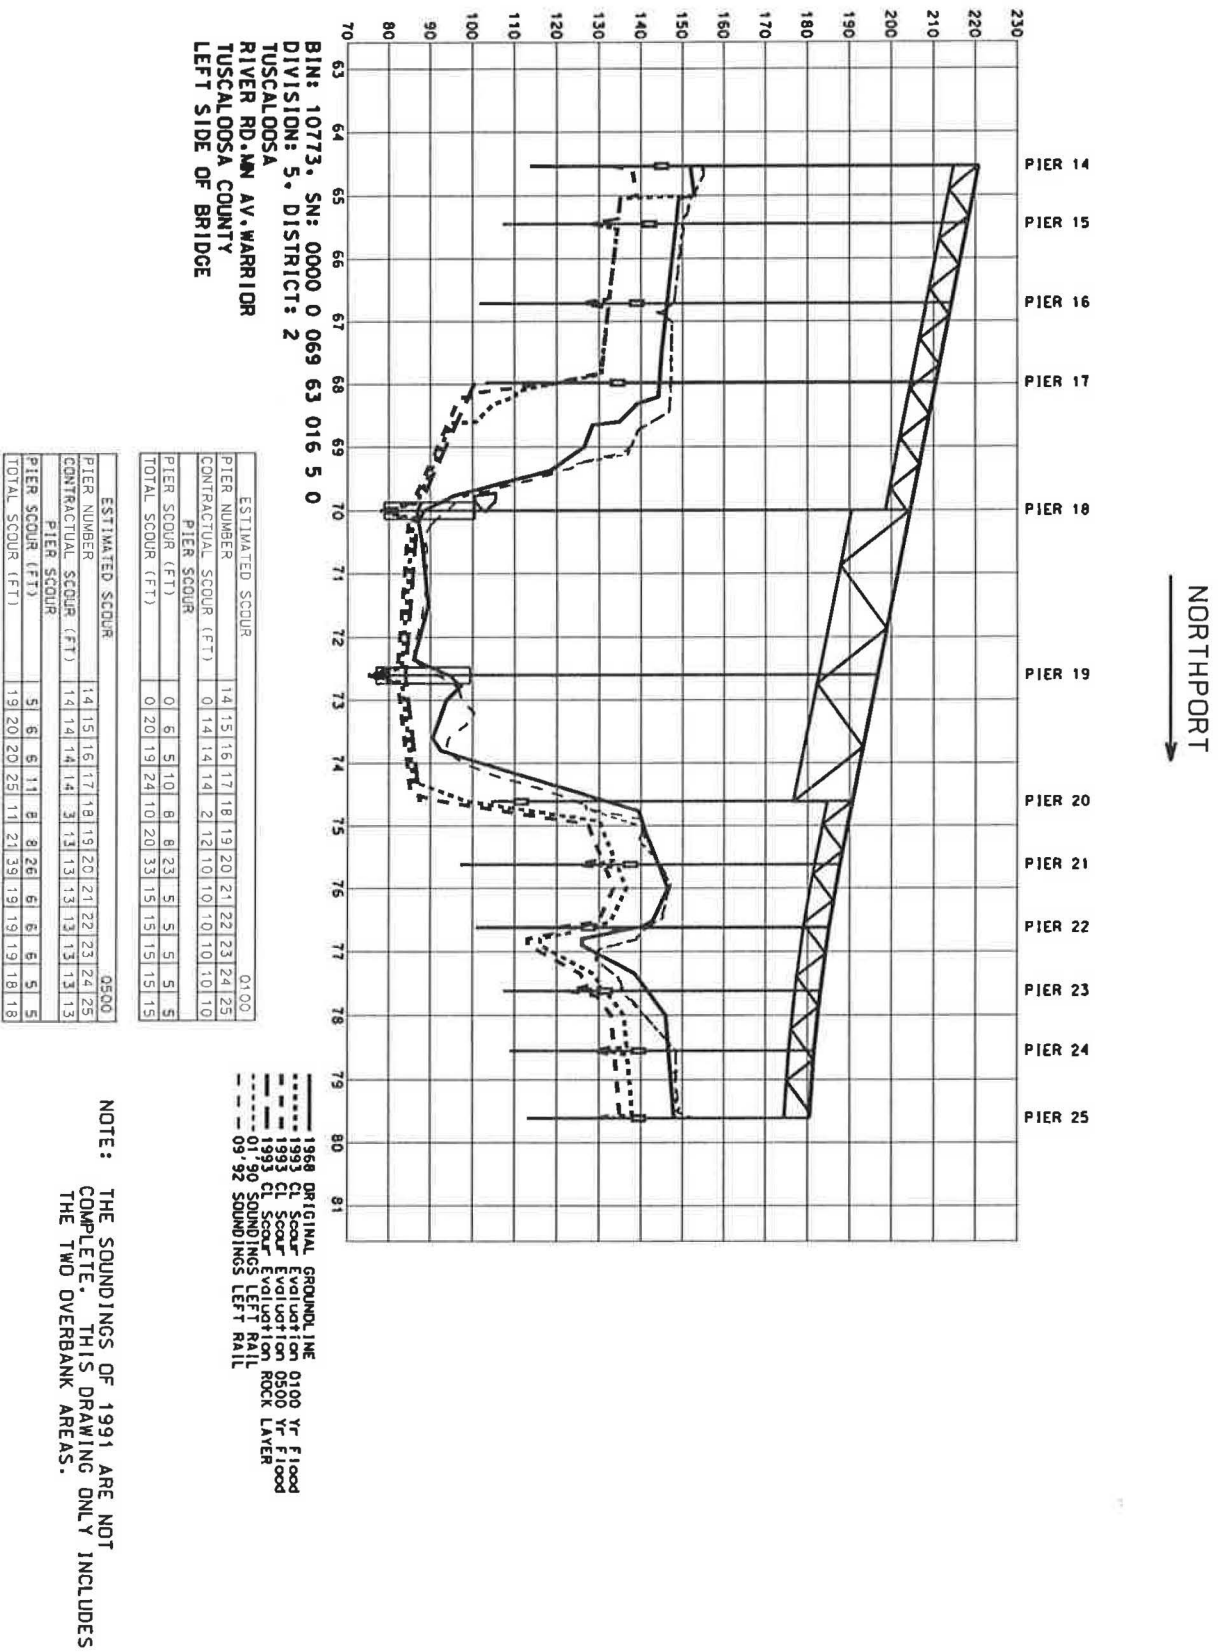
Typical plot from ABIMS scour module showing bridge elevation view and stream profiles.
